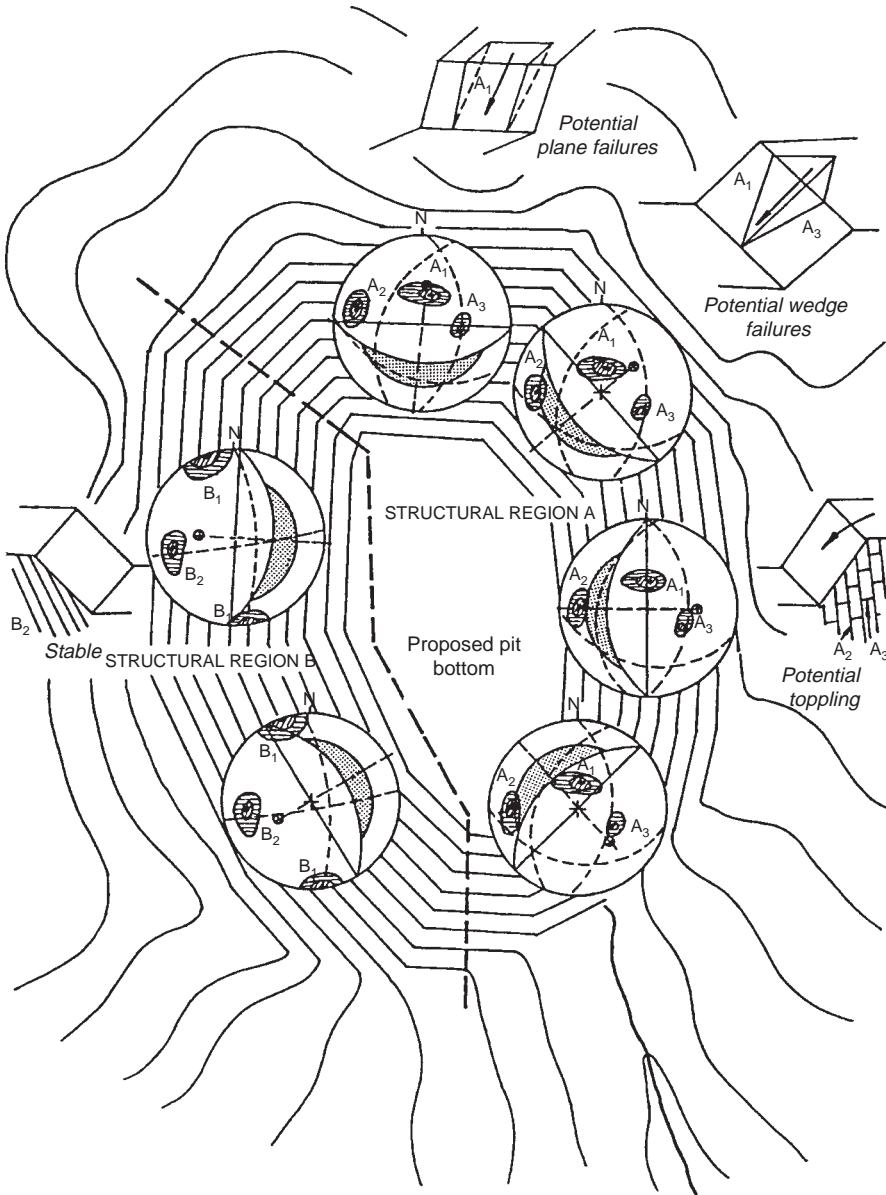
Presentation of structural geology information and preliminary evaluation of slope stability of a proposed open pit mine (Hoek & Bray, 1977).
